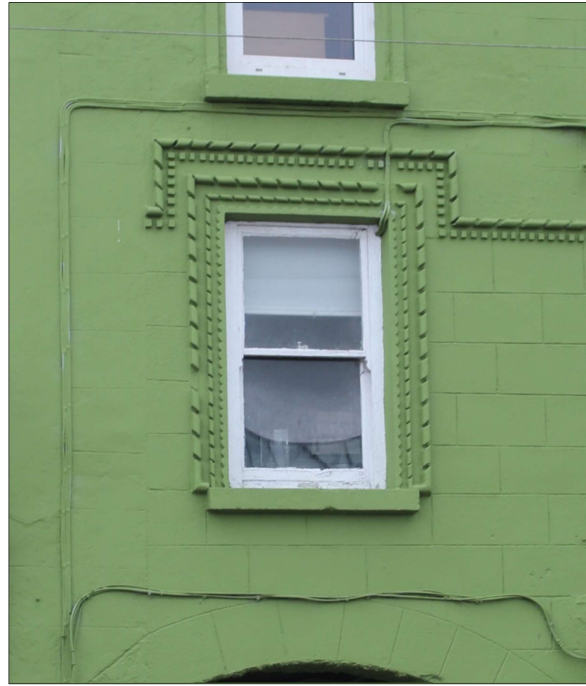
Example of historic window type on Main Street in Templemore that could be used as historic reference for appropriate design of new hardwood timber windows to replace modern windows on similar buildings within the ACA
